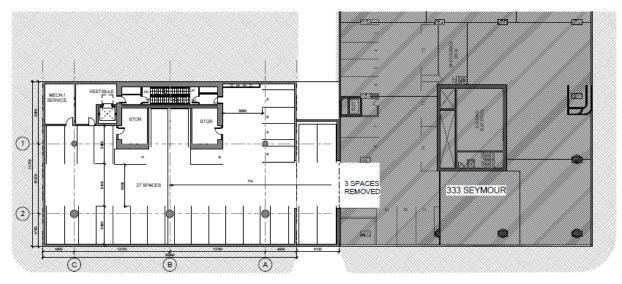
P2 Parking Plan showing parking access from 333 Seymour Street, under the City lane
